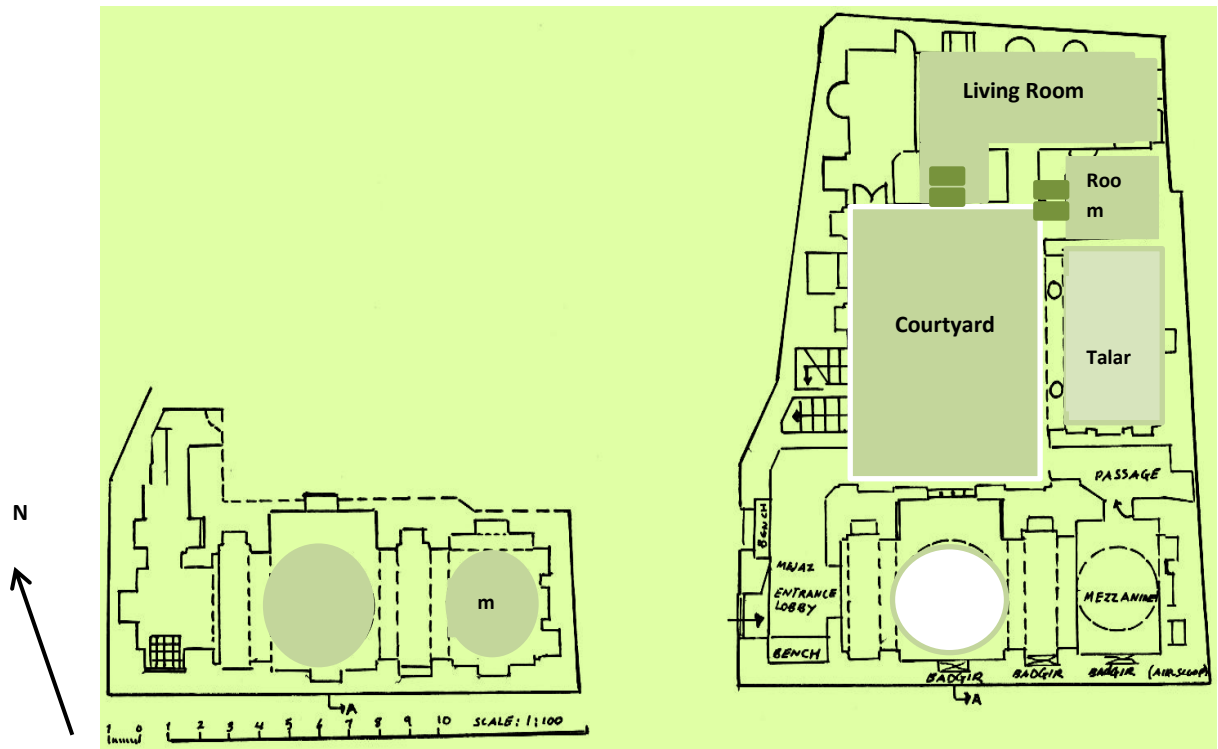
Basement level and ground floor level plans of traditional courtyard house No. 2. Scale: 1:50
